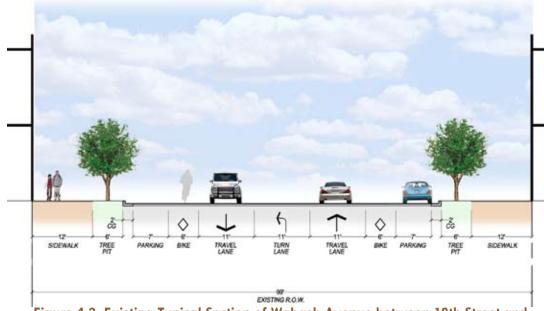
Existing Typical Section of Wabash Avenue between 18th Street and Cermak Road
